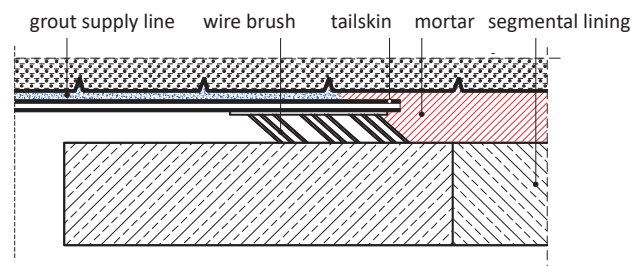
Tail void grouting (after Thewes and Budach, 2009).
